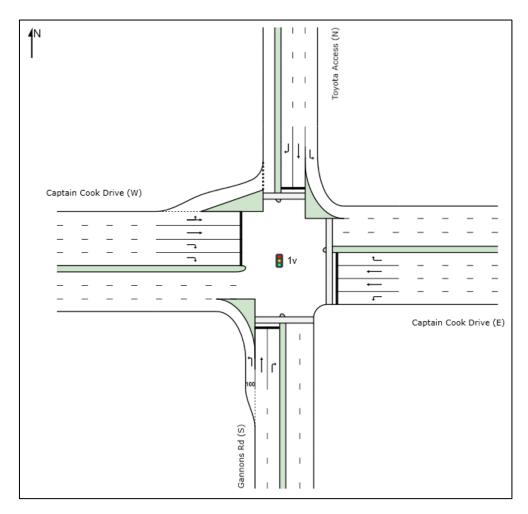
GANNONS ROAD / CAPTAIN COOK DRIVE / SITE ACCESS UPGRADE REQUIRED UNDER WAREHOUSE REDEVELOPMENT
